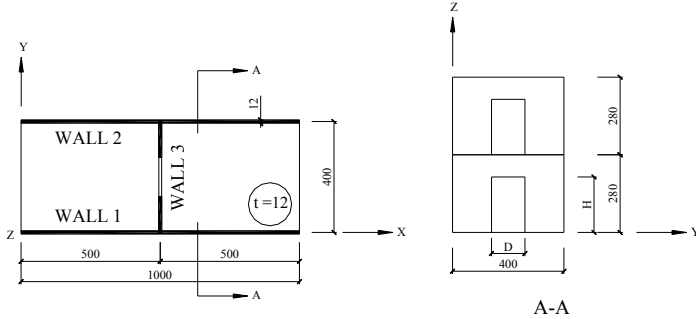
Typical plan and section view for slab-wall interaction model (units are in cm)
